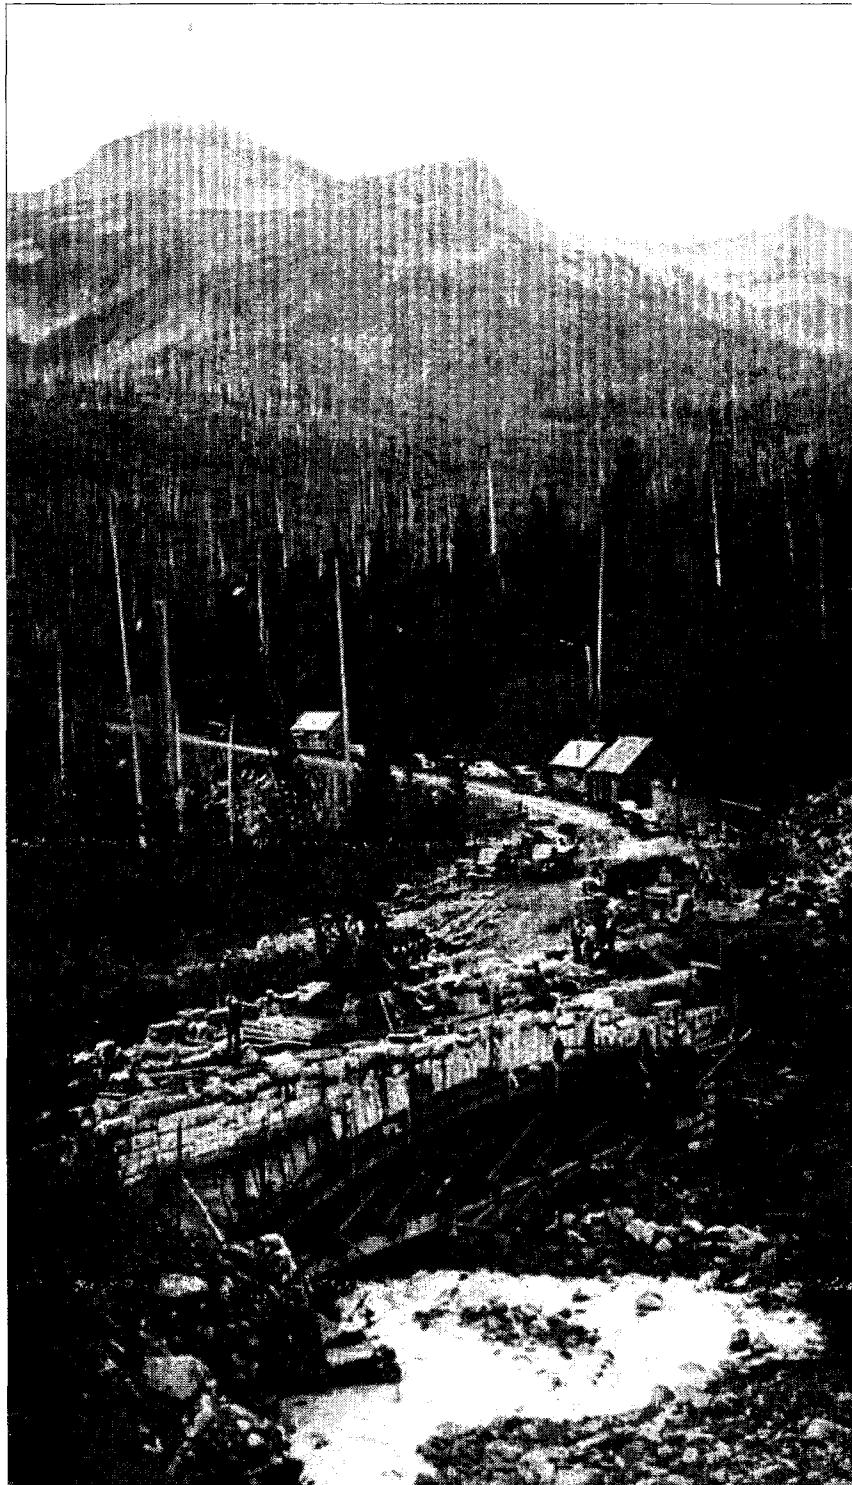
Historic photo showing Stevens Creek Bridge under construction and construction camp, c.1940 (MORA Archive).
